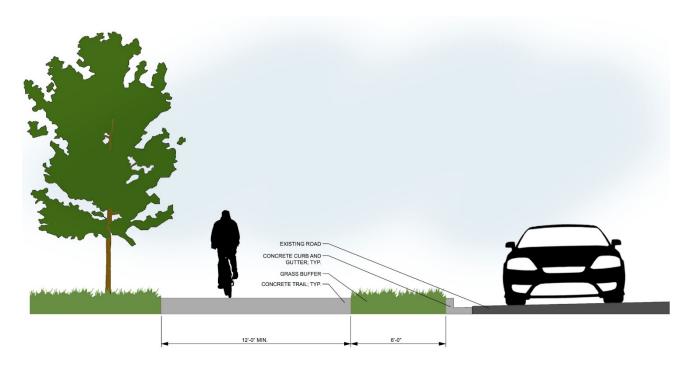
| Typical Greenway Conceptual Cross Section in Street Right-of-Way
